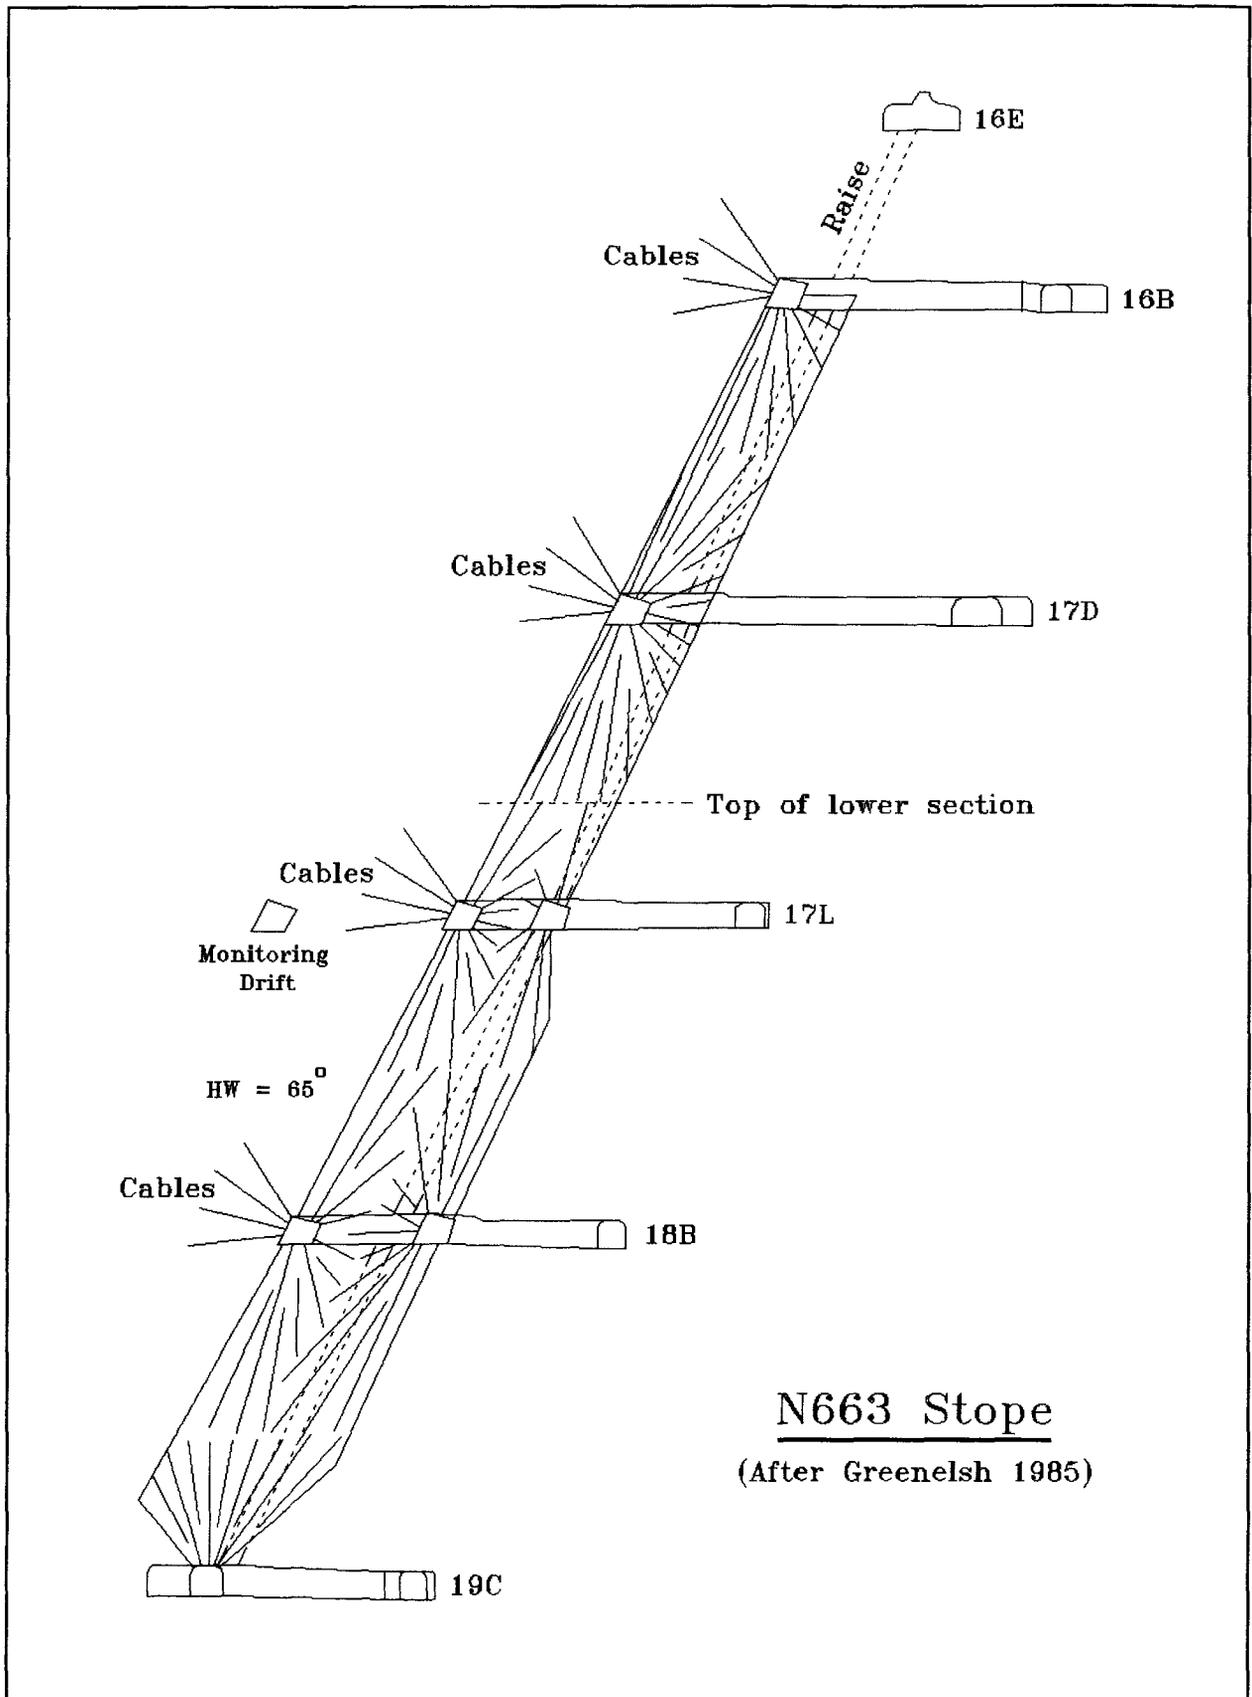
N663 stope case history of point anchor hangingwall cable support
